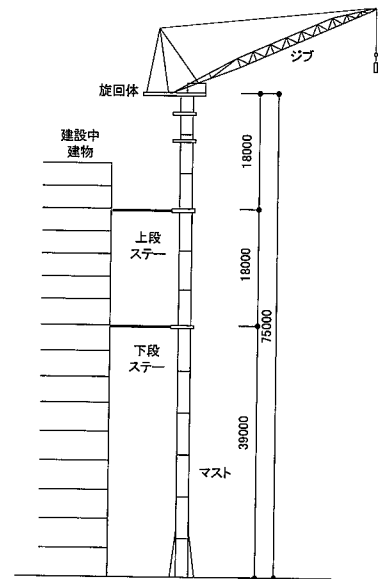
The outline drawing of the full-scale tower crane. 実大タワークレーンの外観図
